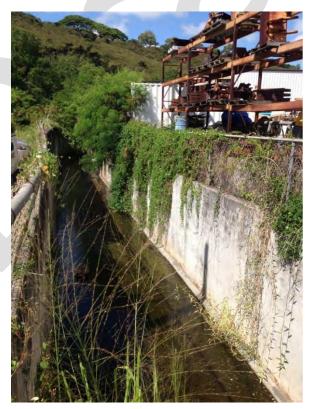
View looking southeast at southern property boundary showing concrete lined channel and steep slope of adjacent property
